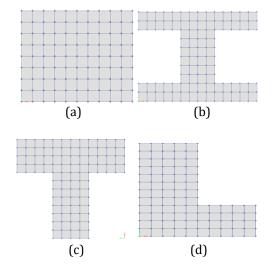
Plan (a) Rectangular shaped (b) I-shaped (c) T- shaped (d) L-shaped of the building.
